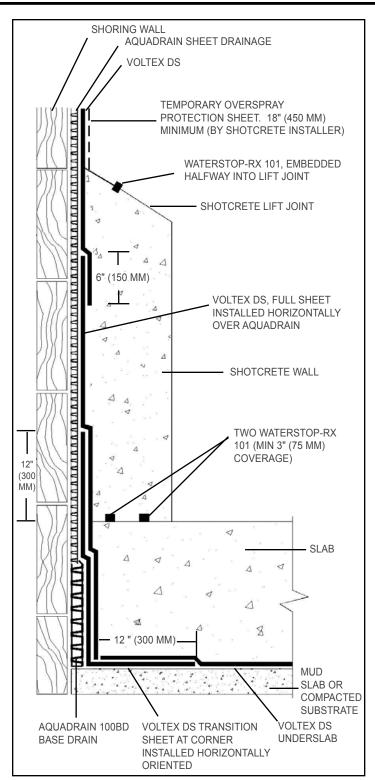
NON-HYDROSTATIC SHOTCRETE WALL
